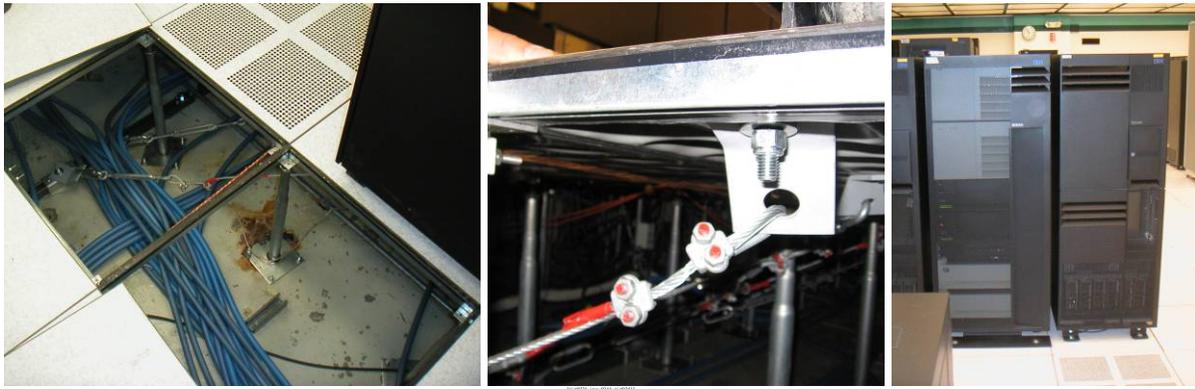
System of tethering equipment in CPU rooms 1 and 2
